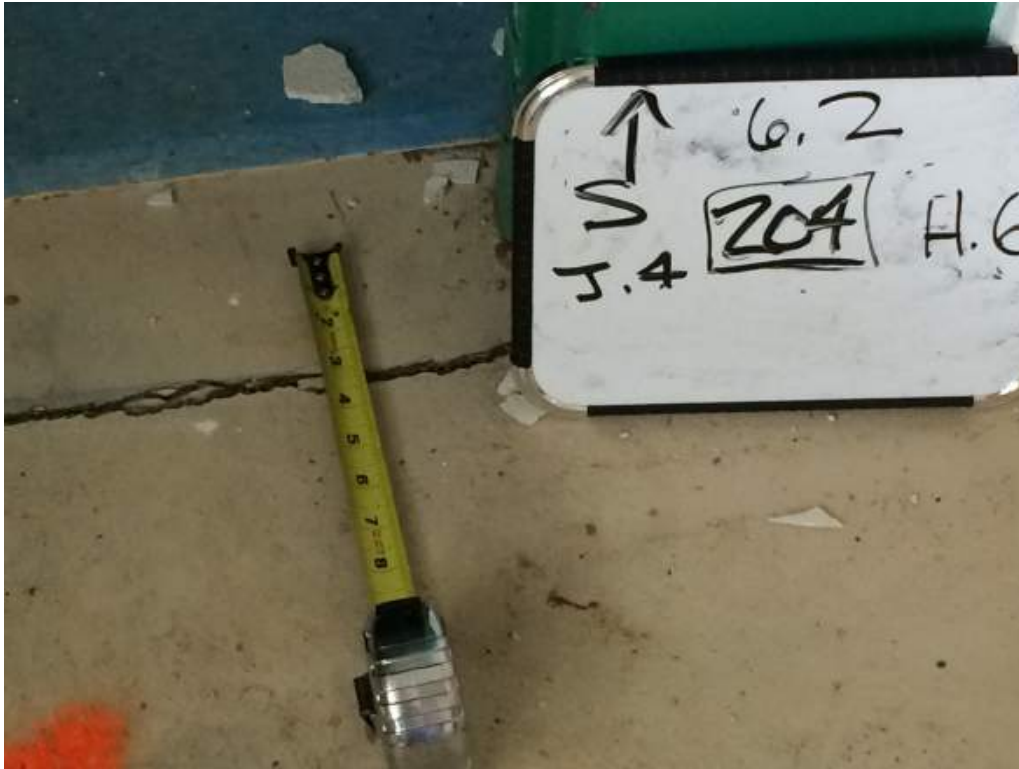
4th Floor – Room 204 –Along col Line 6.2 between H.6 & J.4 –Crack in floor slab
